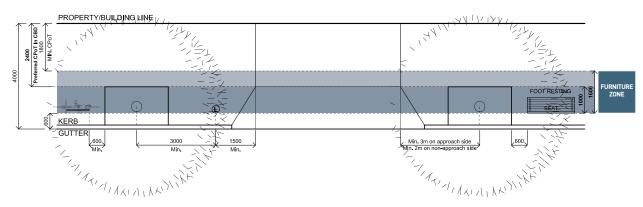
Typical Element Arrangement Diagram - 4.0m wide Footway
